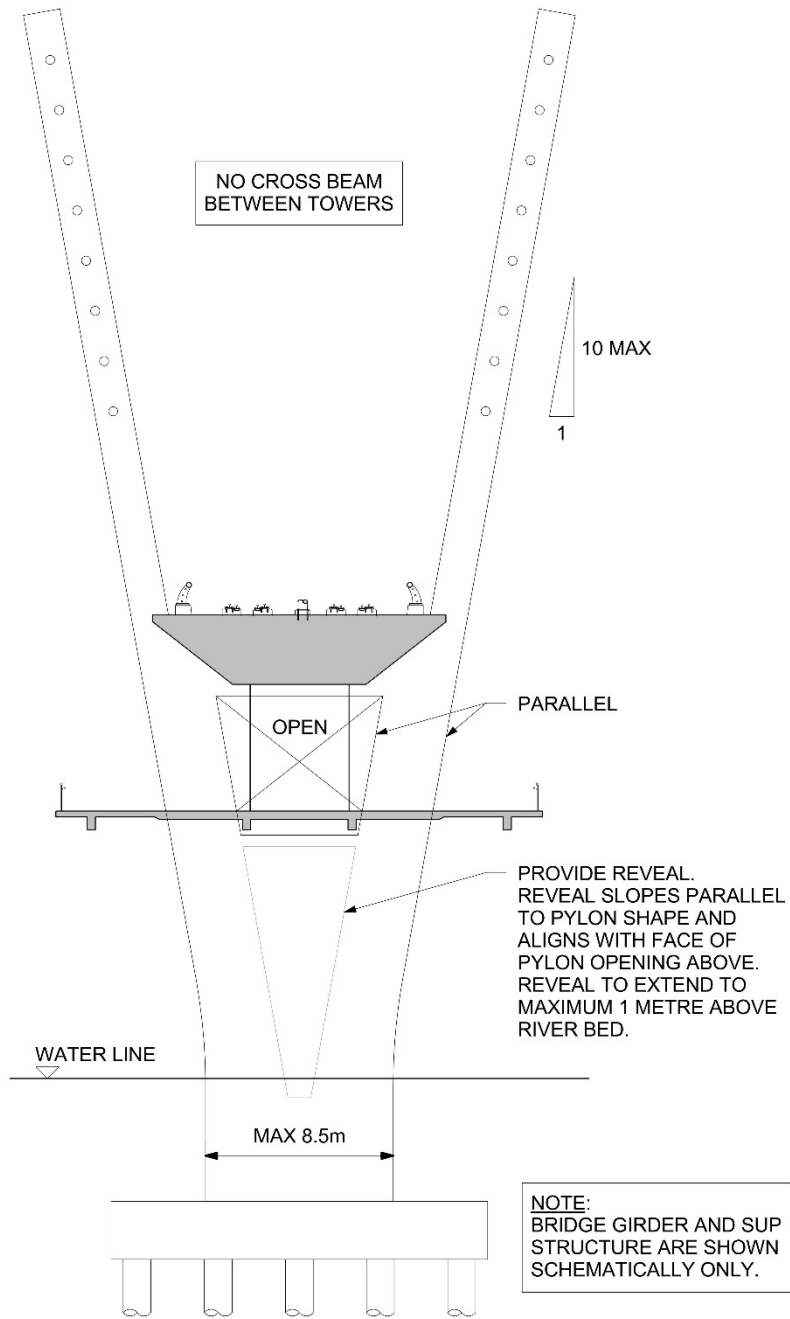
A: Tawatinâ Bridge North River Pier Section
